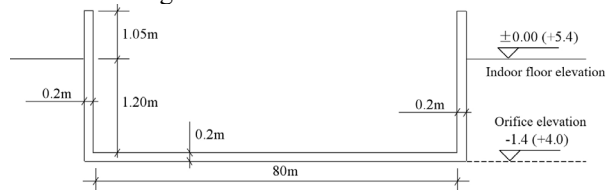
Elevation and dimension diagram of hydraulic test hall
